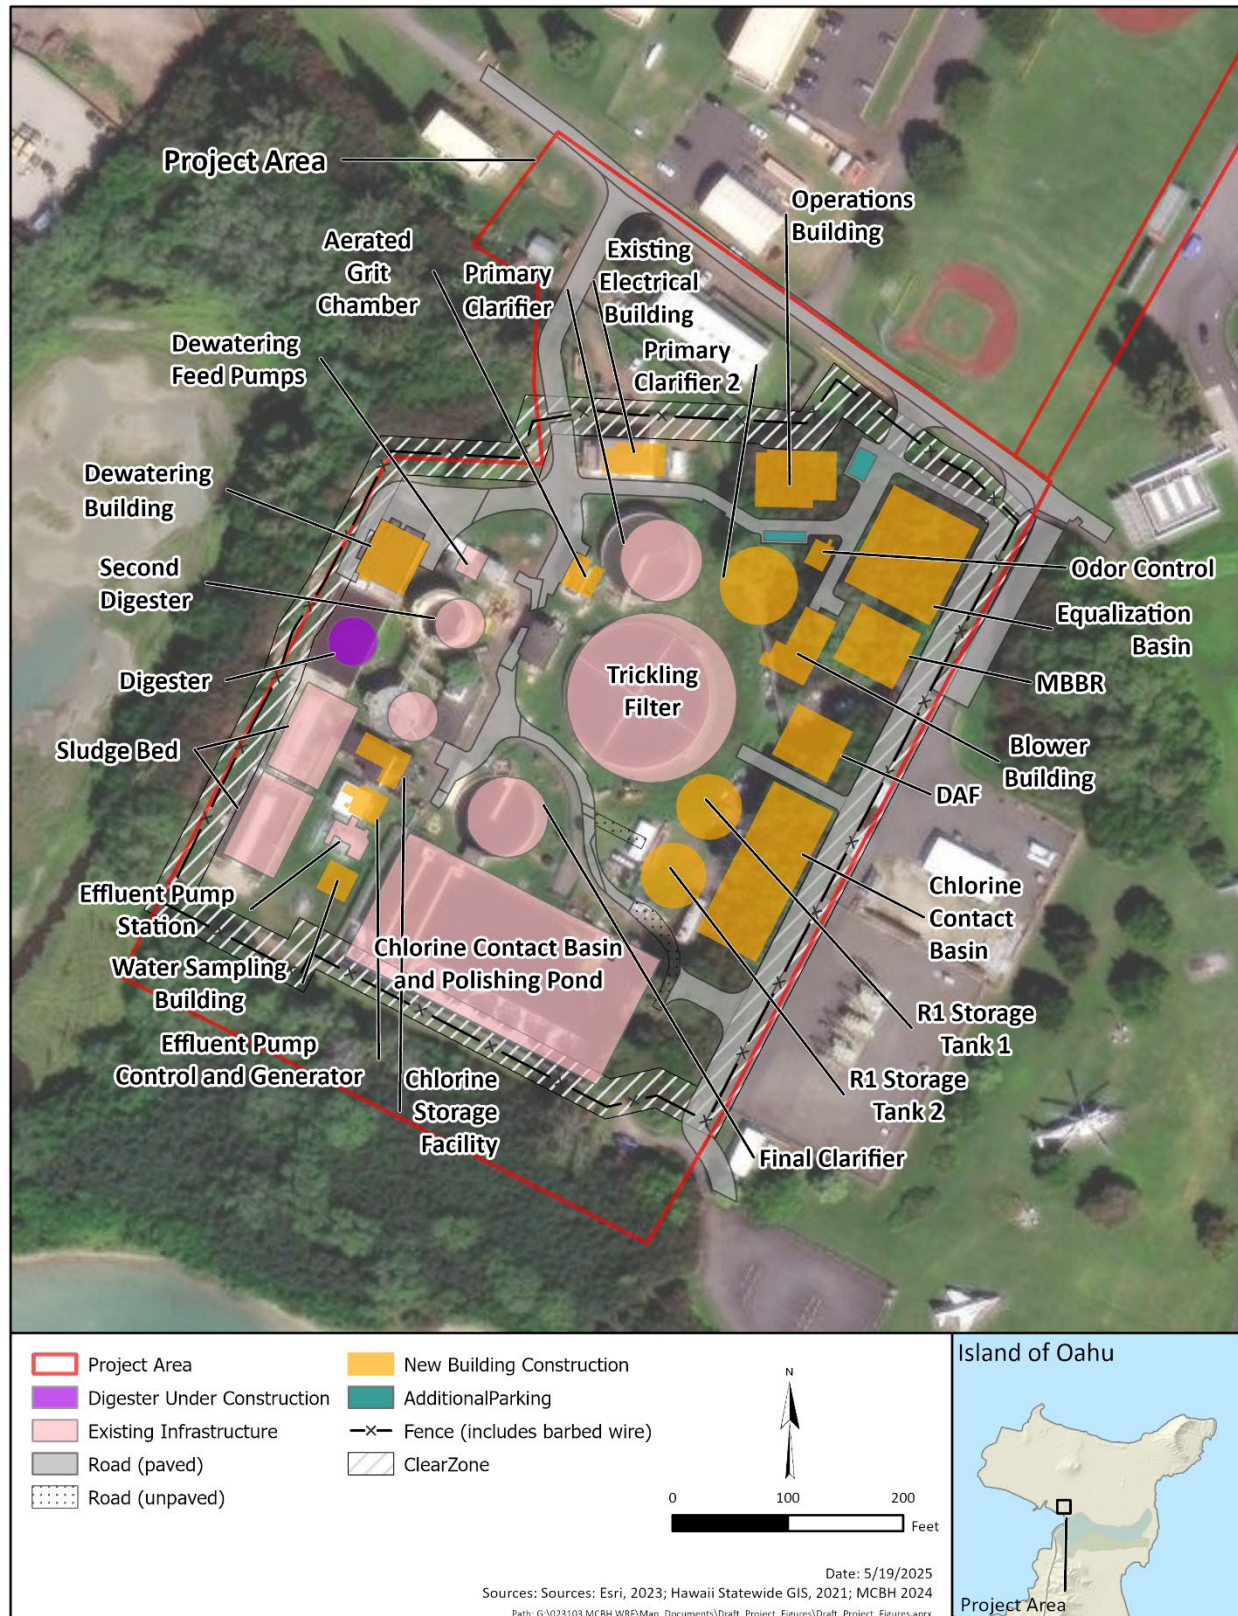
Proposed Water Reclamation Facility Upgrades
